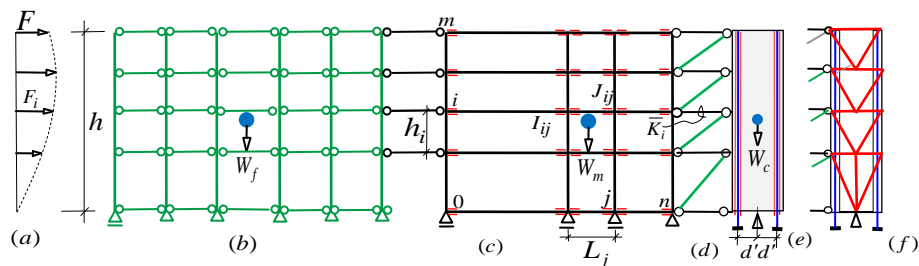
(a) Lateral loading, (b) Articulated gravity frame, (c) Moment frame + Energy dissipating connections, (d) Gap opening link beams and buckling restrained braces, (e) RRC+ stressed Tendons, (f) Braced frame RRC+ stressed Tendons
